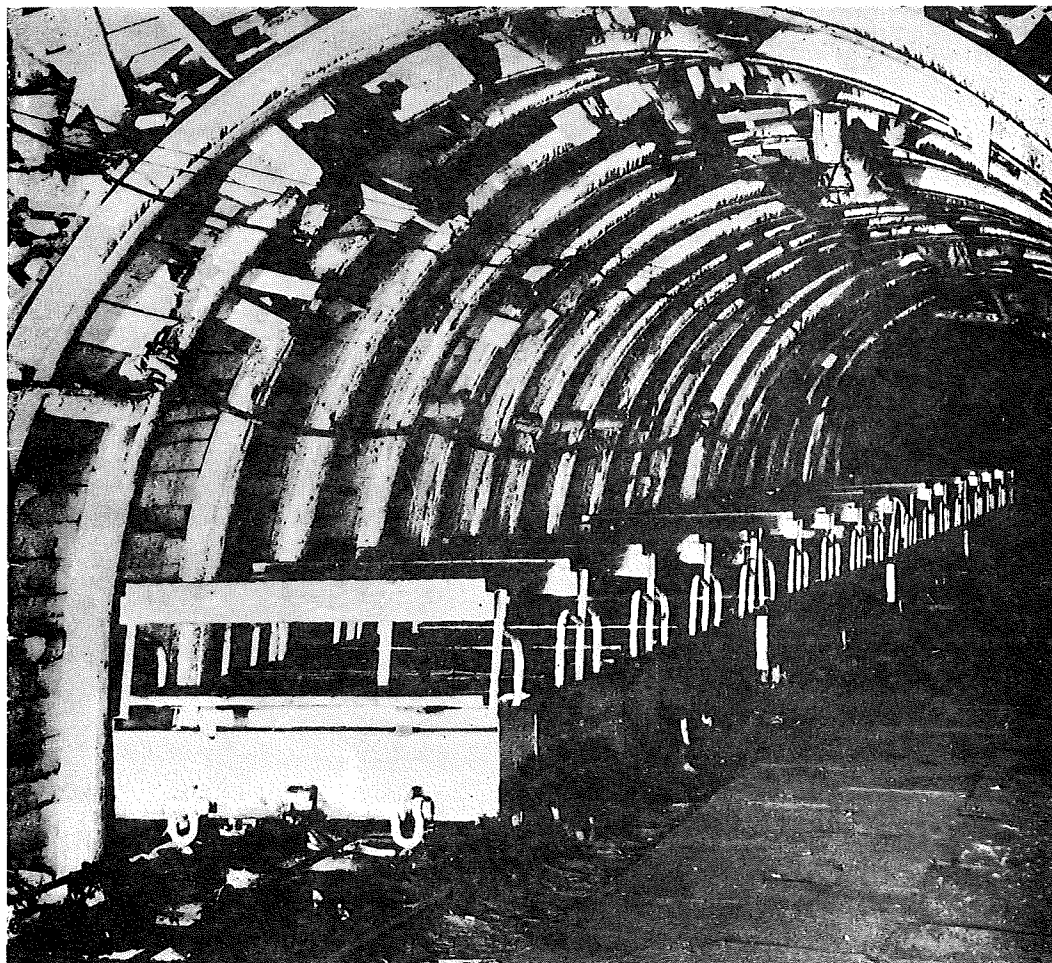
SHEEPBRIDGE CONVENTIONAL ROPE-HAULAGE MANRIDING CARS CAN BE USED DIRECT, ENDLESS, OR MAIN-AND-TAIL. PHOTO IS ENDLESS-ROPE HAULAGE. (PHOTO COURTESY SHEEPBRIDGE EQUIPMENT LTD.)
